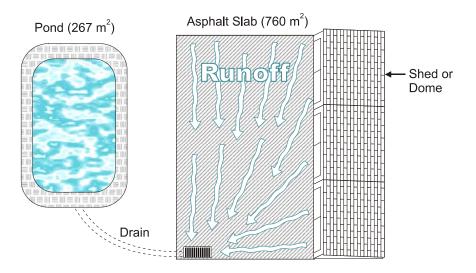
Diagram of Typical Layout of Salt Storage Facility with Average Size Pond and Loading Pad.
